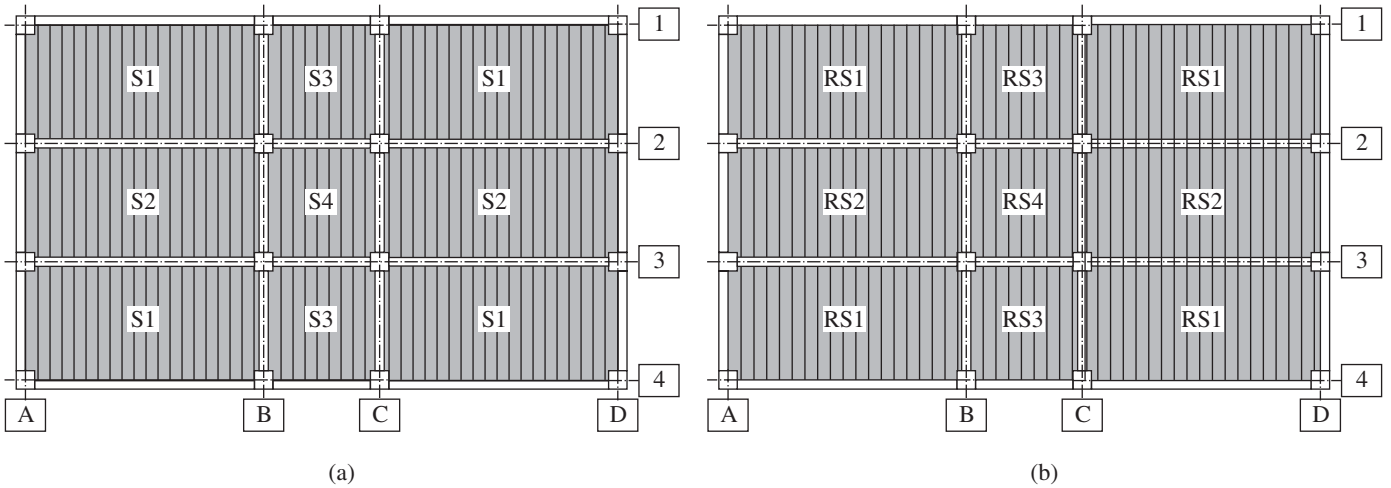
Slab layout (a) First to sixth floors (b) Roof
